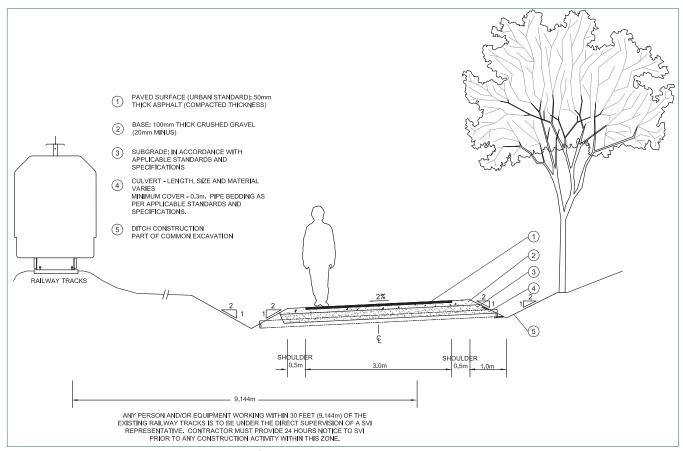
Typical Cross Section B: 30 metre (100 foot) corridor.
